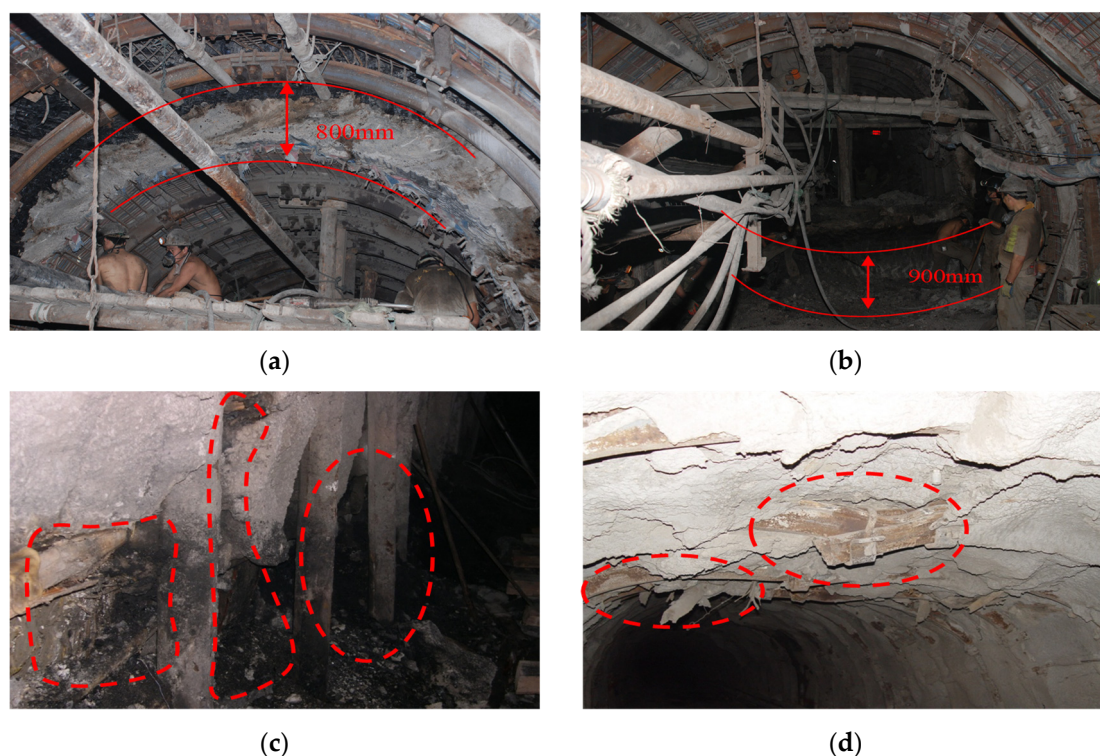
Failure phenomena of the roadway: (a) roof subsidence; (b) floor heave; (c) broken concrete on side walls; (d) broken U-shaped steel frame on roof.
